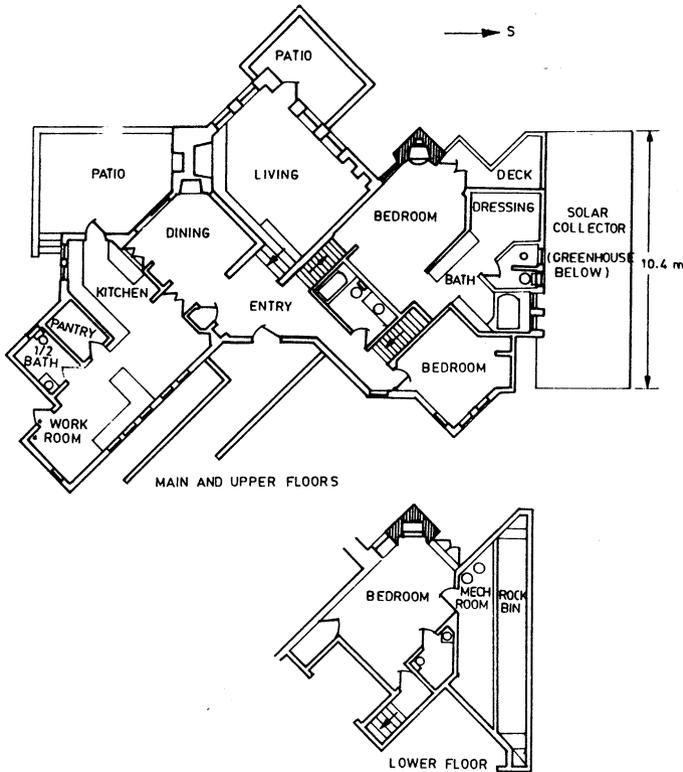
FLOOR PLAN OF MARK JONES HOUSE (From SANDIA[29])
